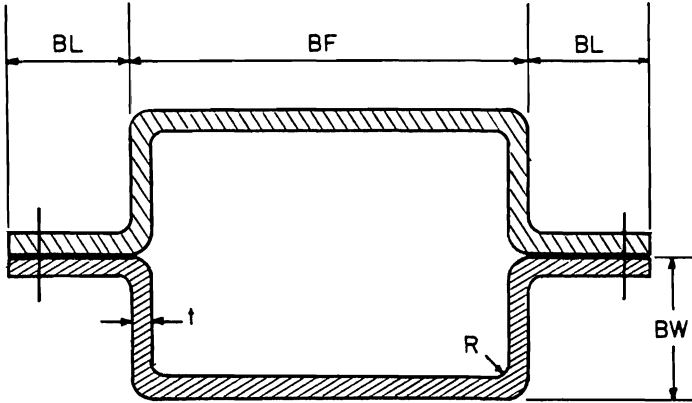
Cross Sections of Box-Shaped Stub Columns
